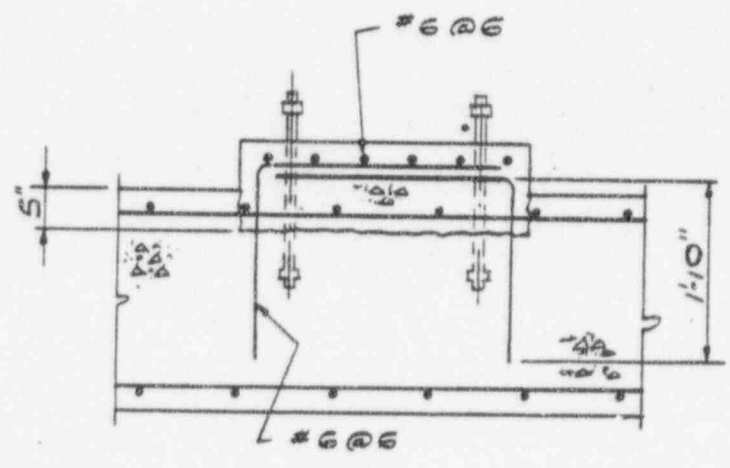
Typical Mechanical Equipment Pad and Anchor Bolt Detail
